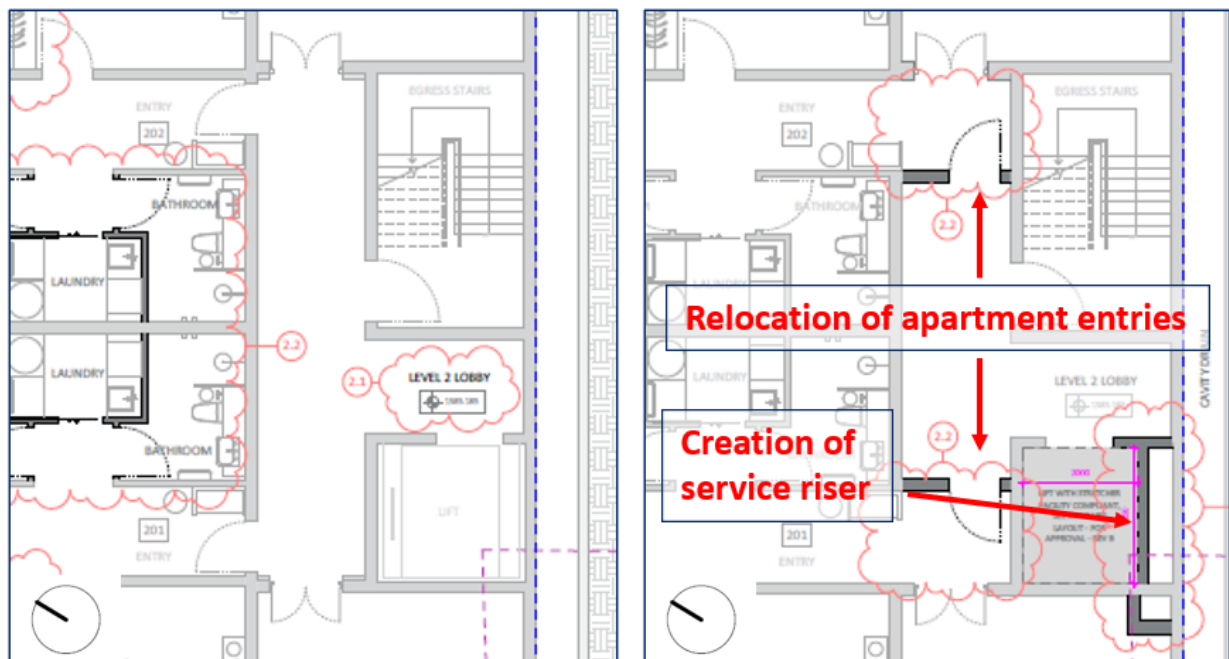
| Approved (left) and proposed (right) Level 2 apartment entries (Source: Department's Stamped Plans 2022 and Applicant's SEE 2023)
